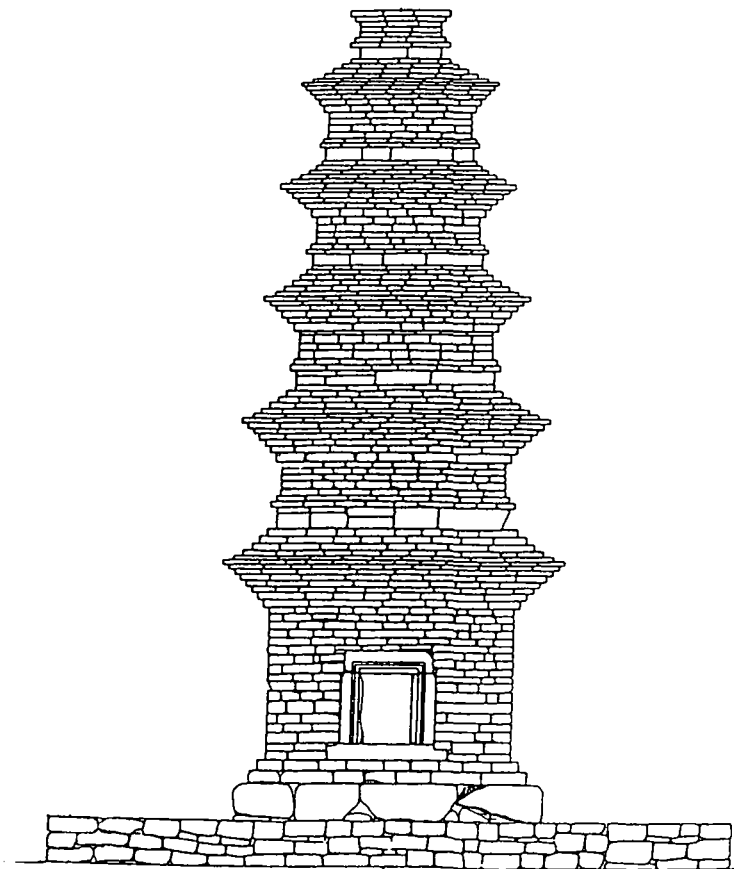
Southern elevation of the brick-like stone pagoda at Bong-kam-dong 鳳甘洞 봉감동 (mid-7th C. AD?, reconstruction in Ko-ryŏ, scale: 1 : 100) (after: *MHCSRBS* 88 - 2, p. 13)
